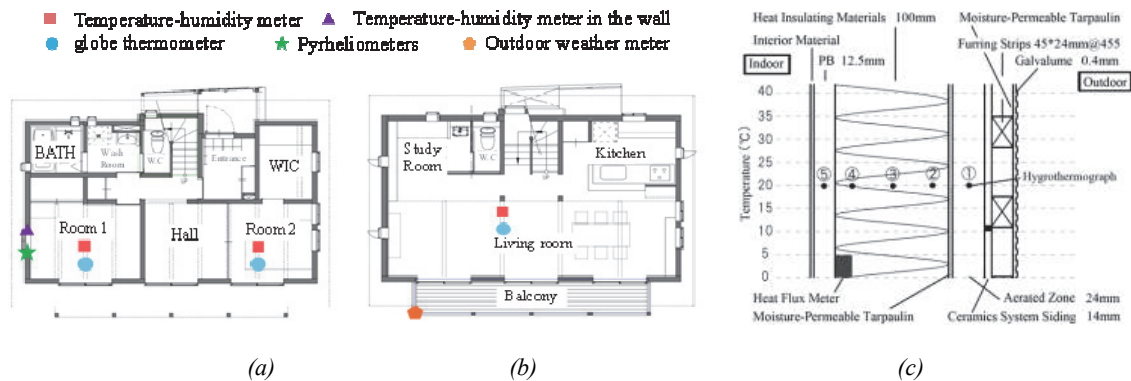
(a) 1st floor measurement plan; (b) 2nd floor measurement plan; (c) measurement plan for walls
